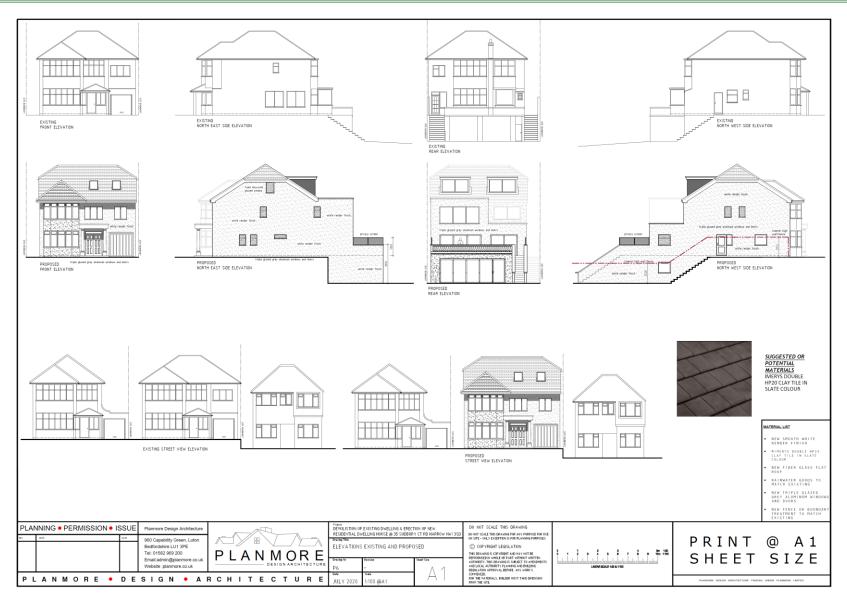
Existing and Proposed Elevations (Reproduced by courtesy of Planmore)
